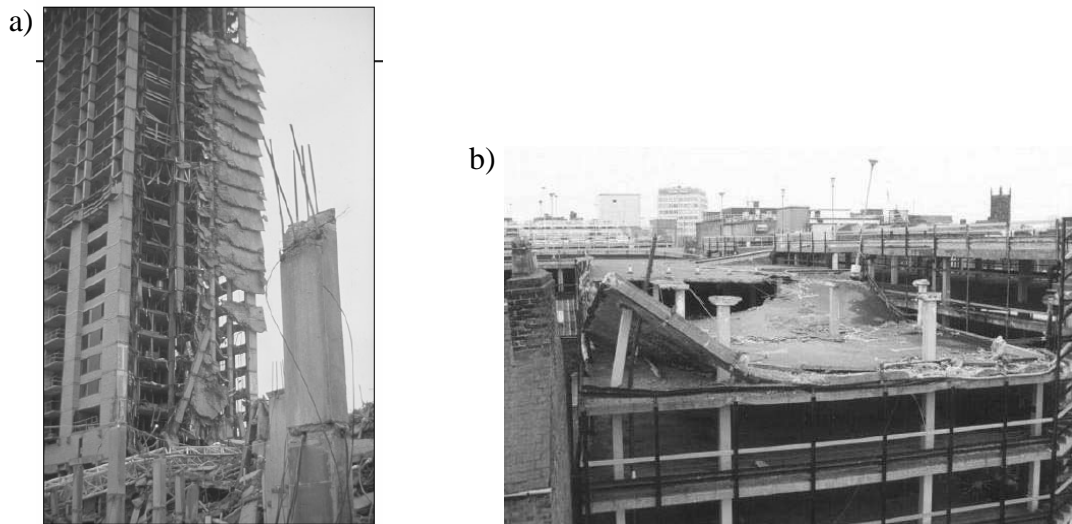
Collapse of a) Skyline Plaza [11], b) Pipers Row park garage [10]
